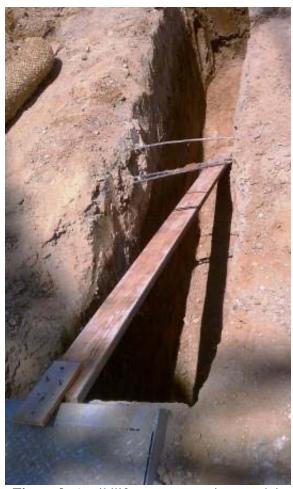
A wildlife escape ramp in a conduit trench at Encina Substation. The biologist reported a mouse used this ramp to escape after falling in the trench during construction.
